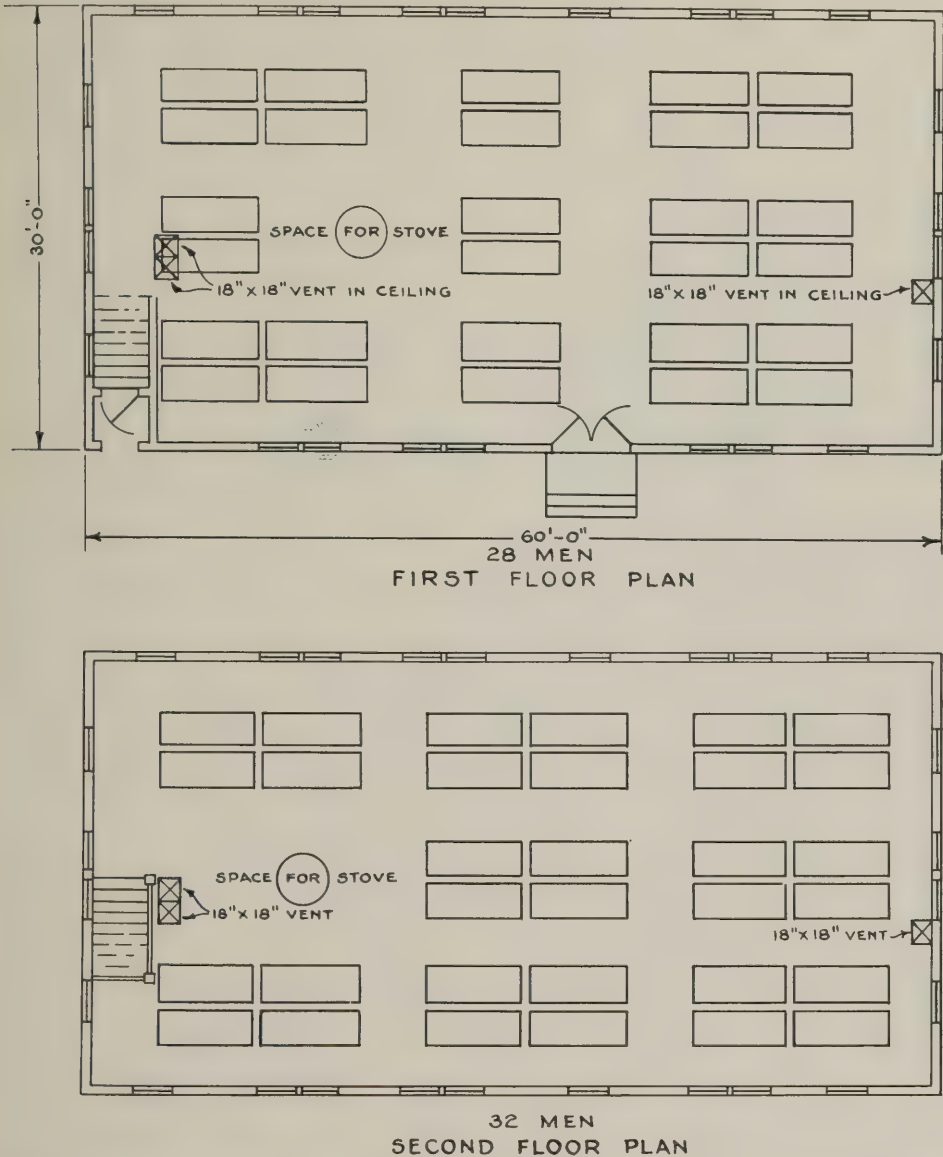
Two-story barrack for 60 men, designed to accommodate overflow from large barrack (fig. 7). Provides 55 square feet of floor space and 530 cubic feet of air space per man. Essentially the same as Figure 12, which was designated to shelter 66 men
